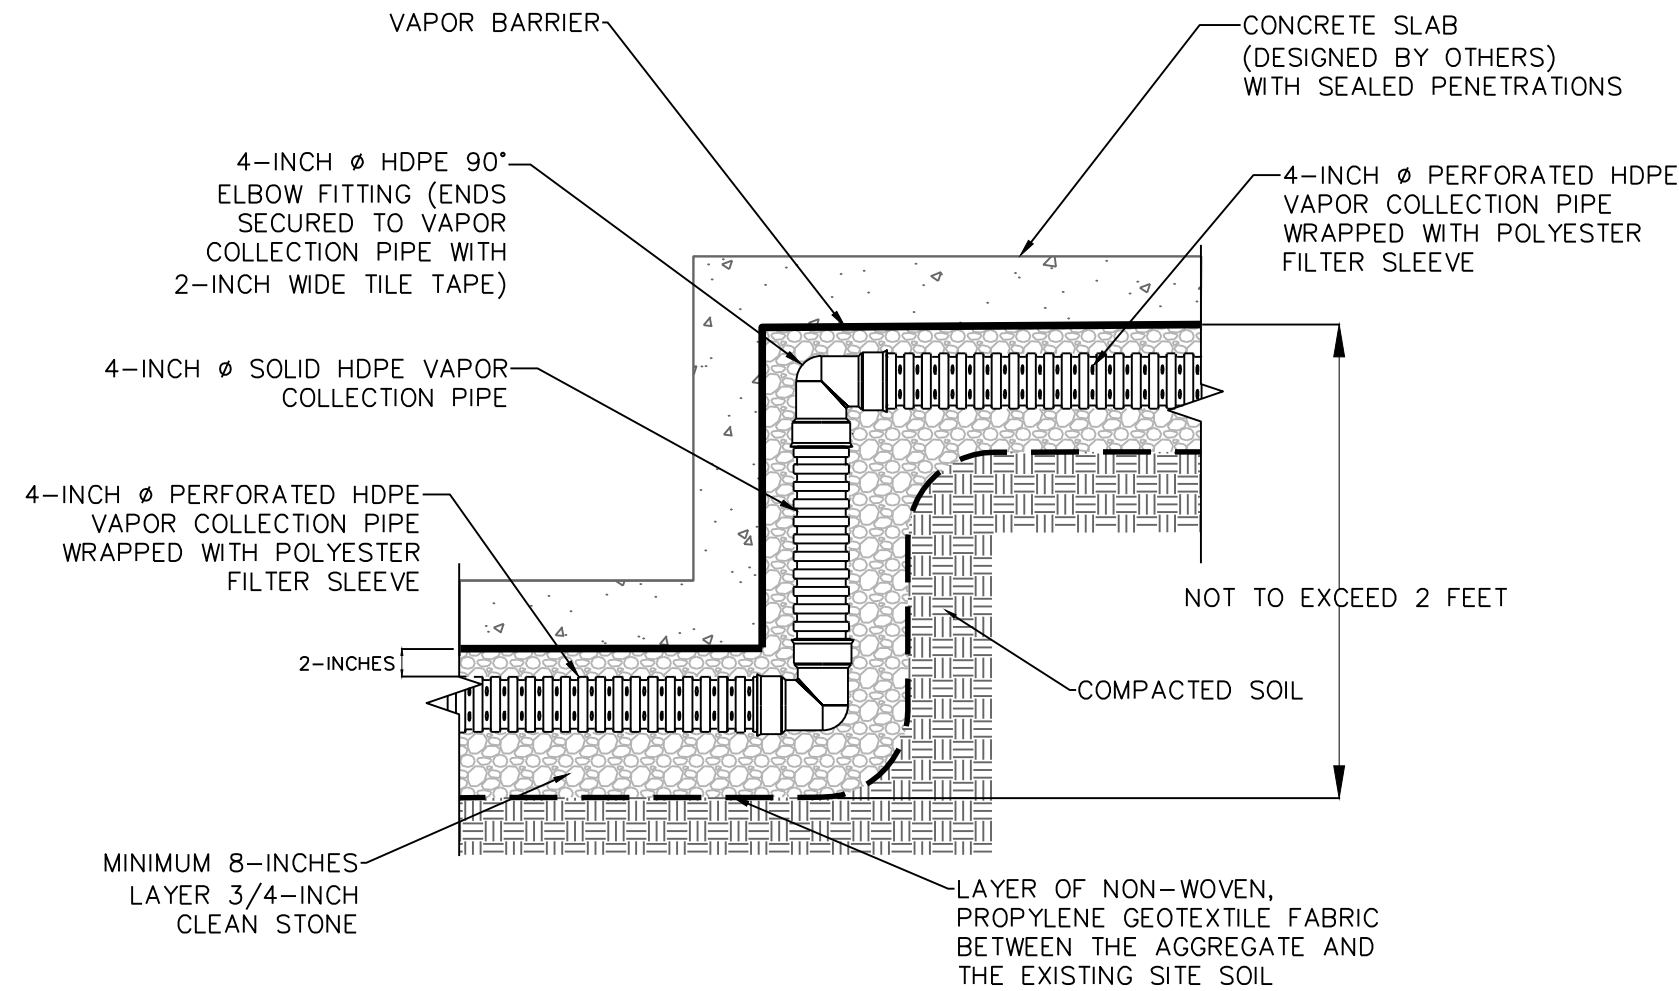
TYPICAL DETAIL FOR INTERIOR FOOTING
